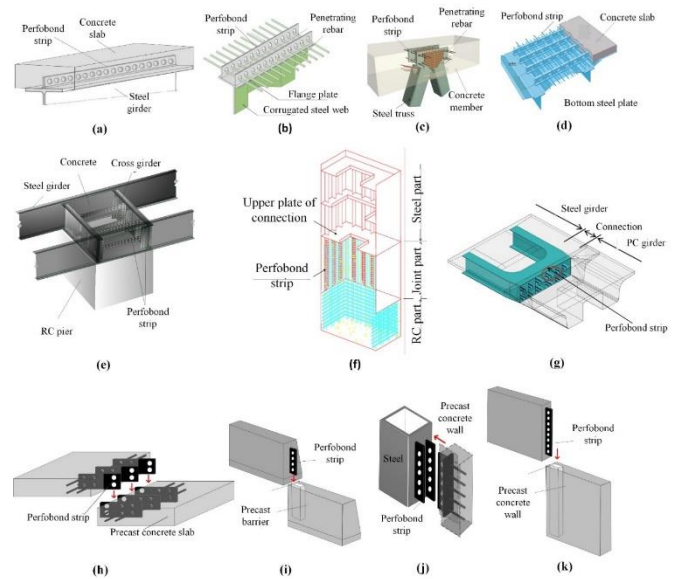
Various applications of the PBLs: (a) Composite girder bridge; (b) Steel web PC bridge, (c) Steel truss web composite bridge; (d) Composite deck, (e) Rigid connection between pier and concrete slab, (f) Hybrid pier, (g) Hybrid girder bridge, (h) Joint of precast concrete slabs, (i) Joint of precast concrete barriers, (j) Joint between steel columns and precast concrete walls, and (k) Joint of precast concrete walls
